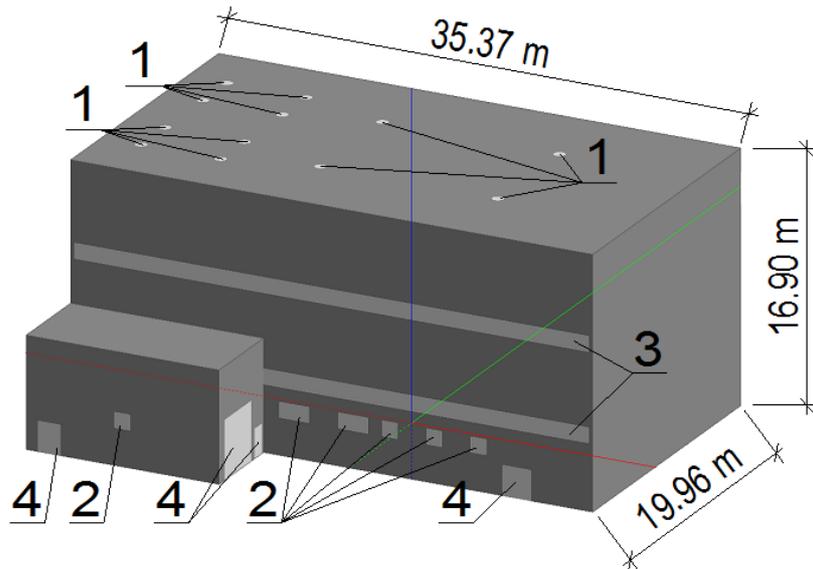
Building geometrical model, where: 1 – exhaust roof fan, 2 – air intake, 3 – window, 4 - door
